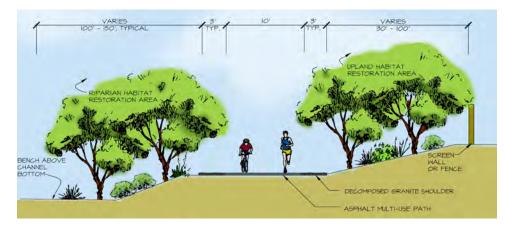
D: Typical Greenway Cross-Section Escalante Road - North Approximately 600 Feet
